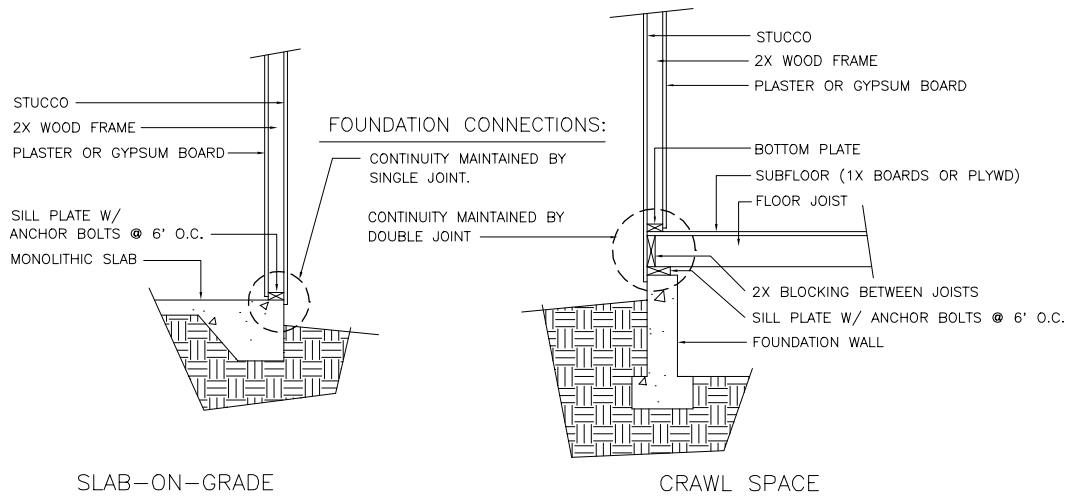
Detail of the foundation connections for crawlspace and slab-on-grade construction built to the outmoded LA City Type V prescriptive requirements.
